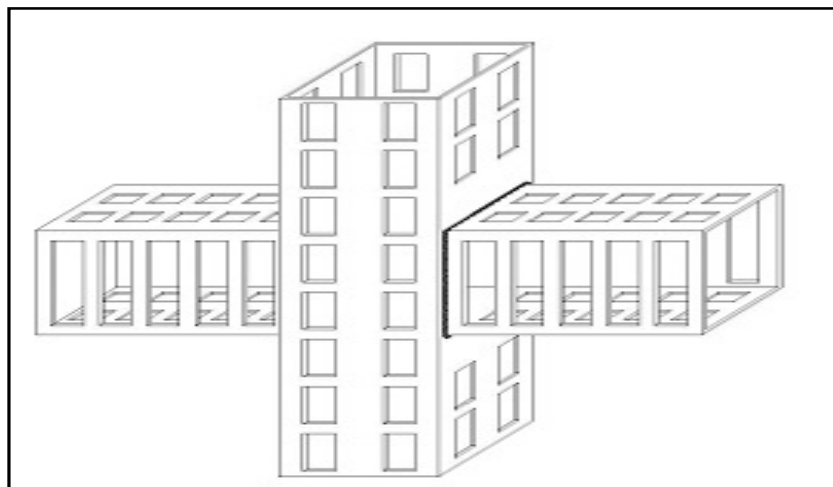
Welding the edges of the beam PCS to column reinforcement
